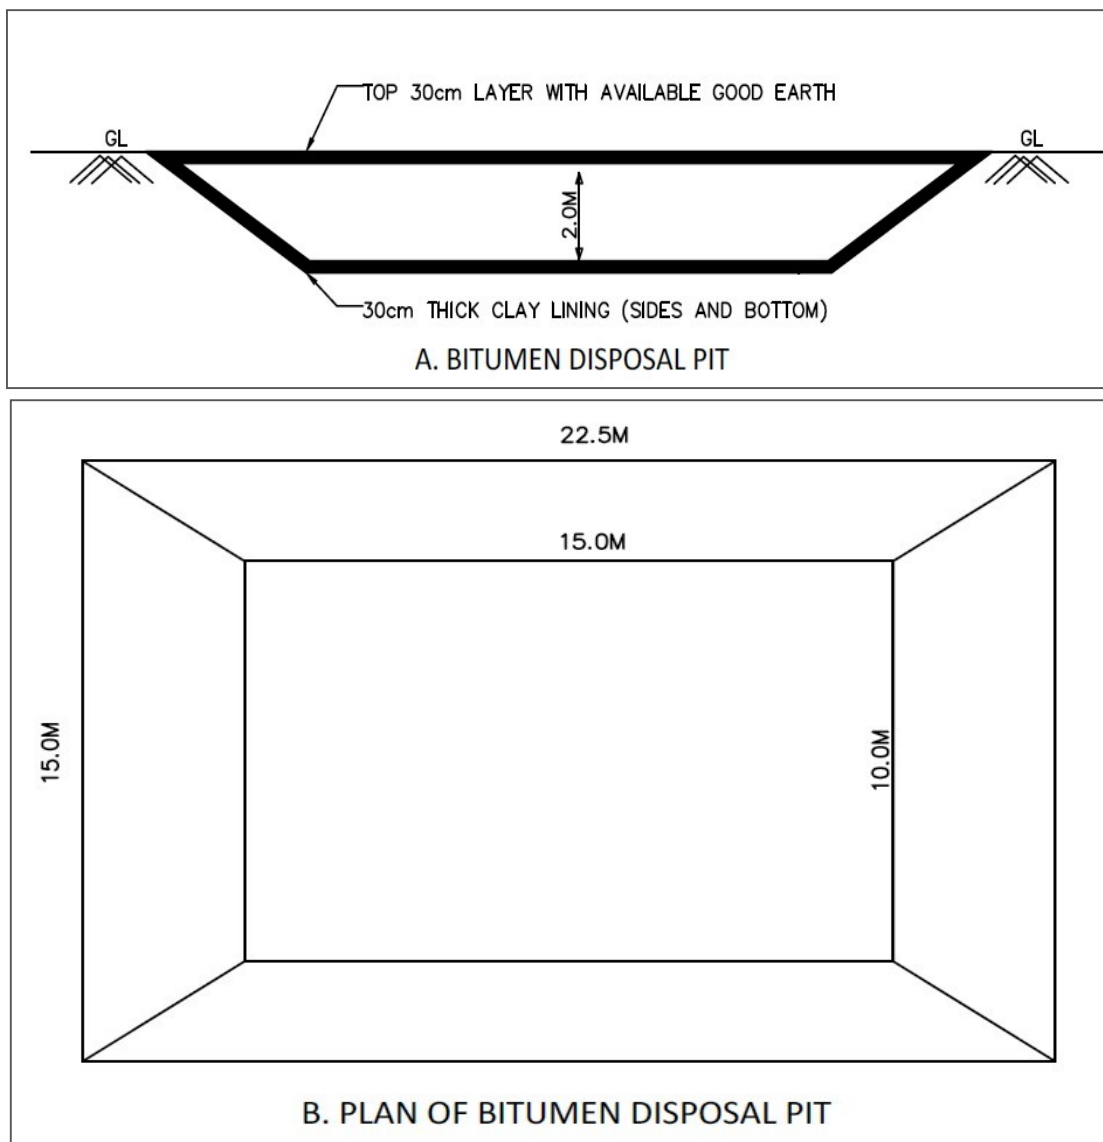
Typical Drawing of Bitumen Disposal Pit
